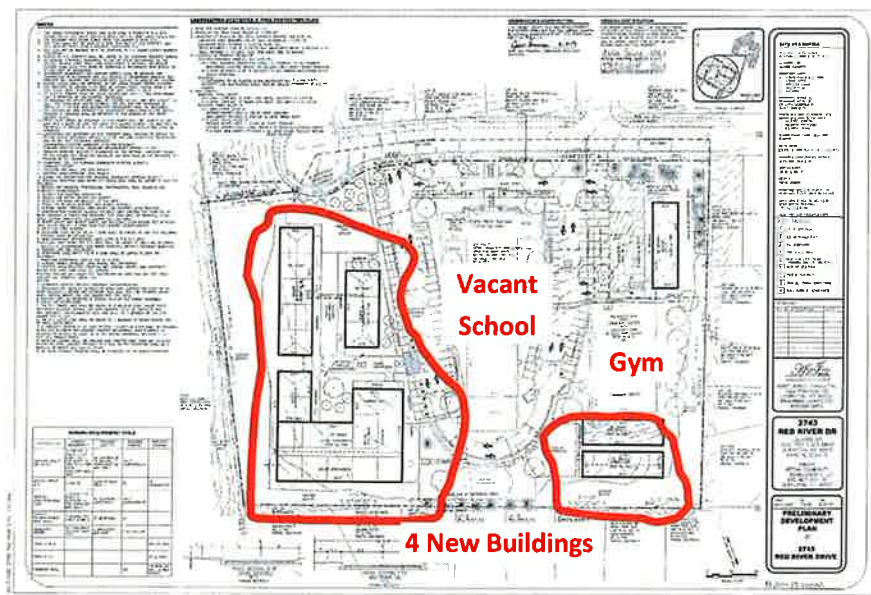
Previous 2017 R-4 Rezoning Design Plan
